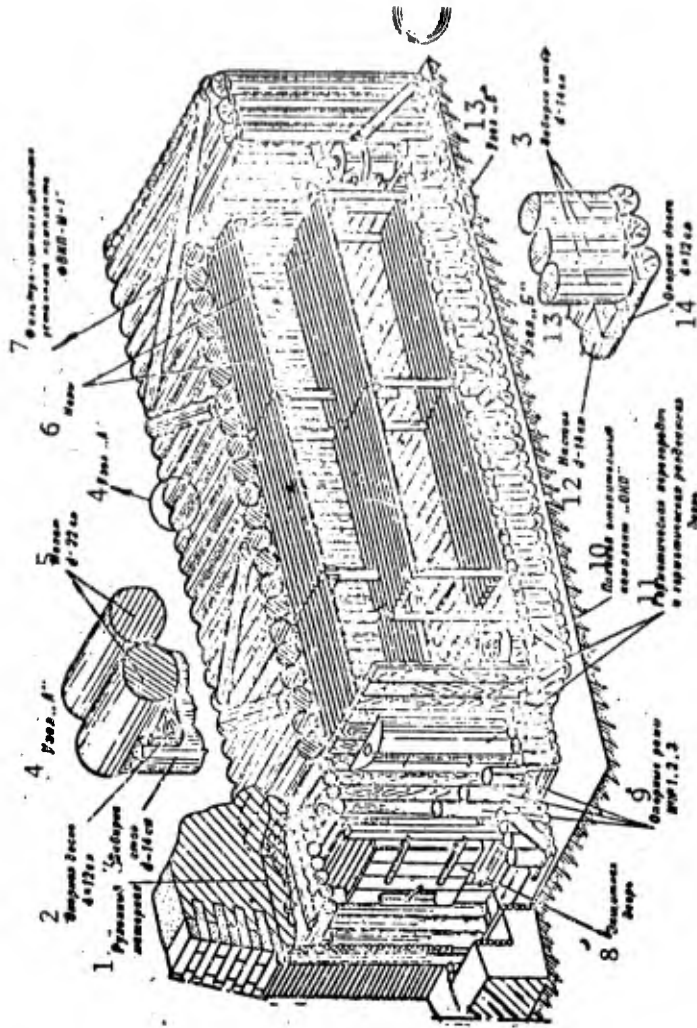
Light-Type Shelter of Continuous Frame Construction (General view). Key: 1, Roofing material; 2, Supporting material; 3, Wall prop; 4, Detail A; 5, Flat wooden roofing; 6, Plank bed; 7, Filtration-ventilation unit of FVKP-M-1 outfit; 8, Protective door; 9, Supporting frames; 10, OKP field heating unit; 11, Airtight partition and airtight extensible door; 12, Flooring; 13, Detail B; 14,
